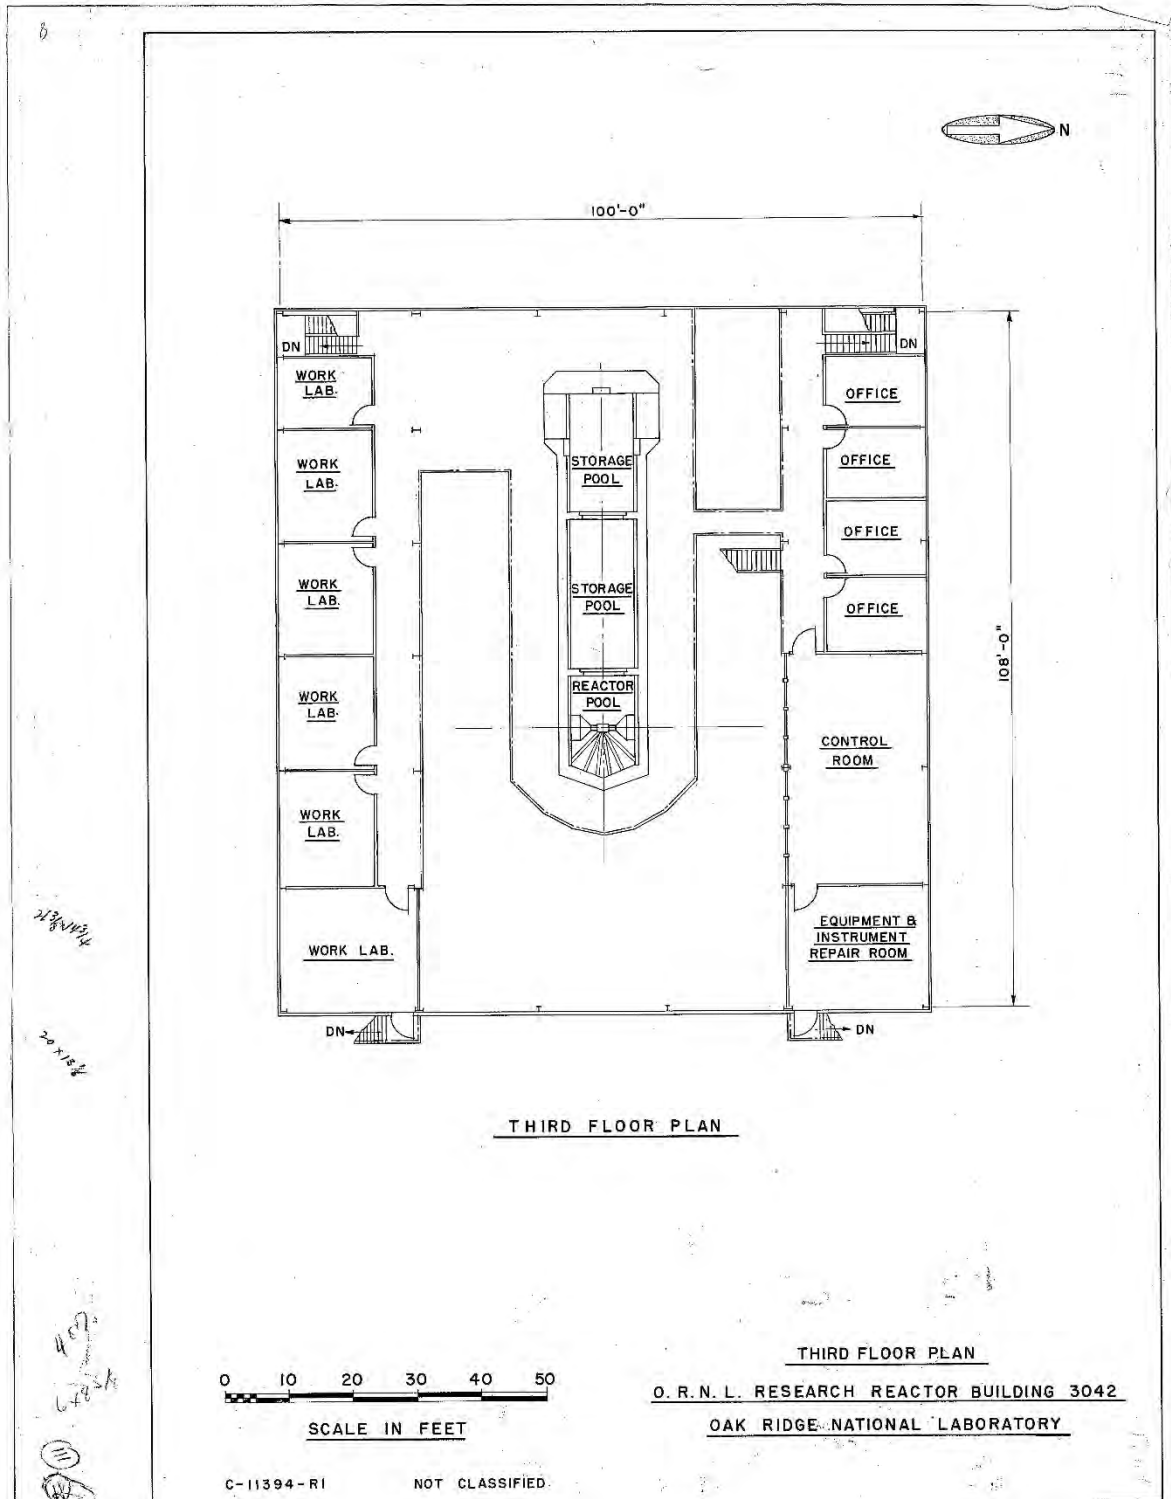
Third floor plan for Building 3042 (Oak Ridge National Laboratory, n.d.).
